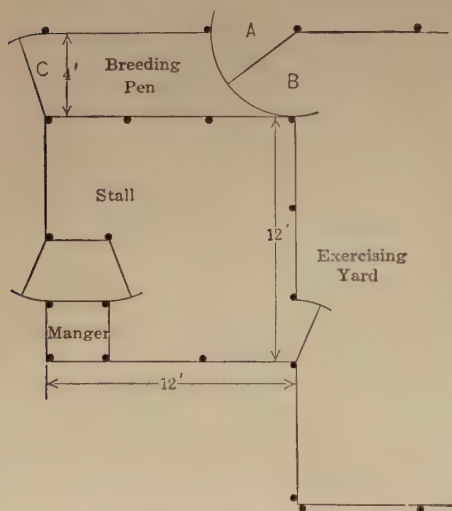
FLOOR PLAN OF BULL STALL AND EXERCISING YARD
